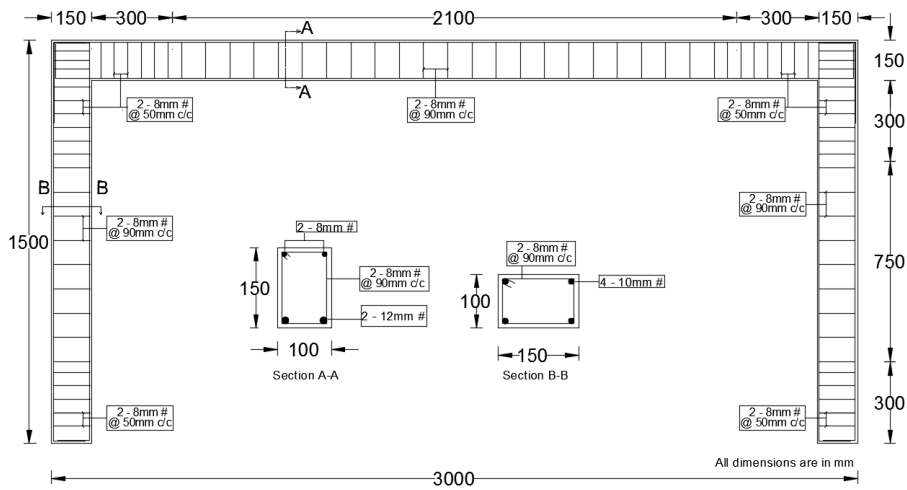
Reinforcement detailing of monolithic portal frame (ML)
